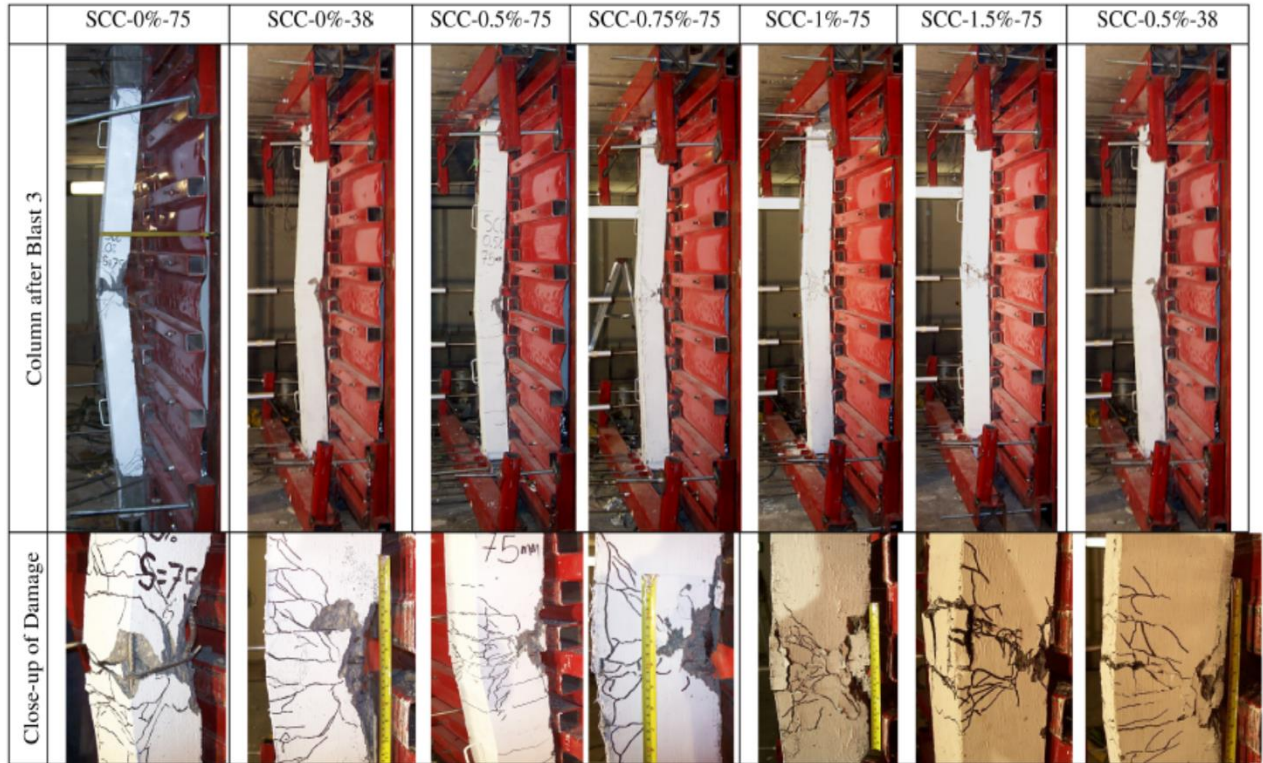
Column failure after 3rd blast shot for different columns having different stirrups spacing and percentage of discrete steel fibers in concrete (source:[56]).
